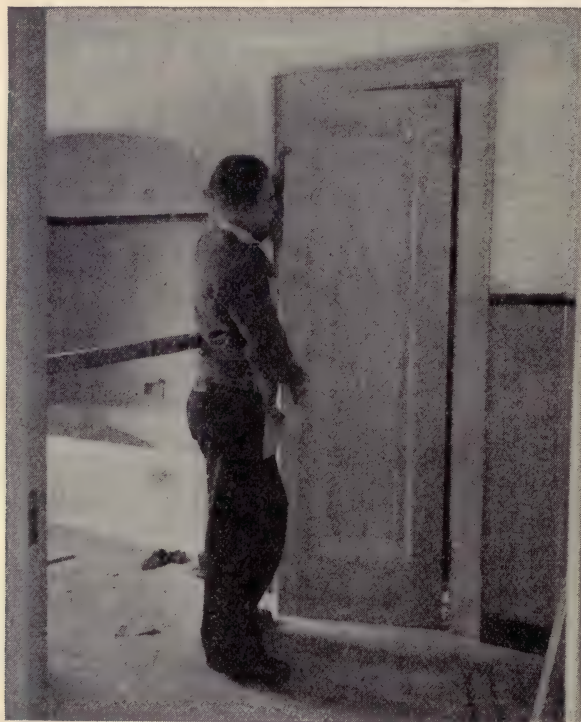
Hanging a door in the Akron, Ohio, "boy-built" house. Better Homes in America encourages the building of houses by schoolboys, in order that the best possible training may be given the next generation of home builders.
